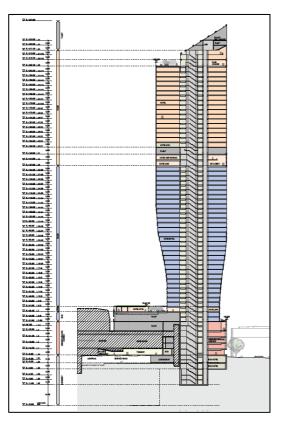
Section 01 through Proposed Tower (FJMT Studio, Sheet No. AF5001)
